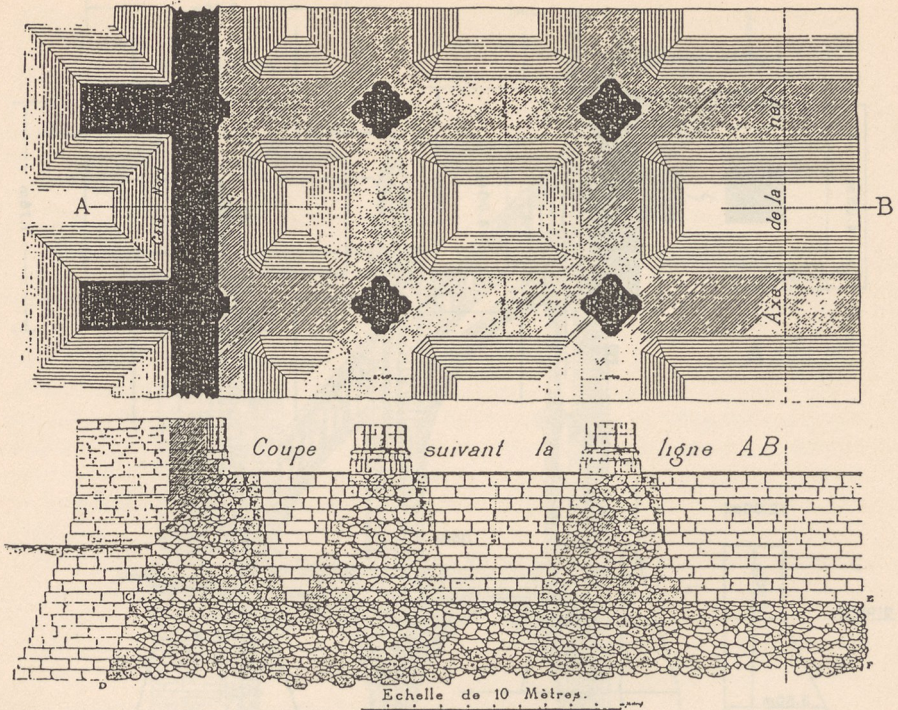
Amiens Cathedral. Plan and section of the foundations in the choir (from Durand).
